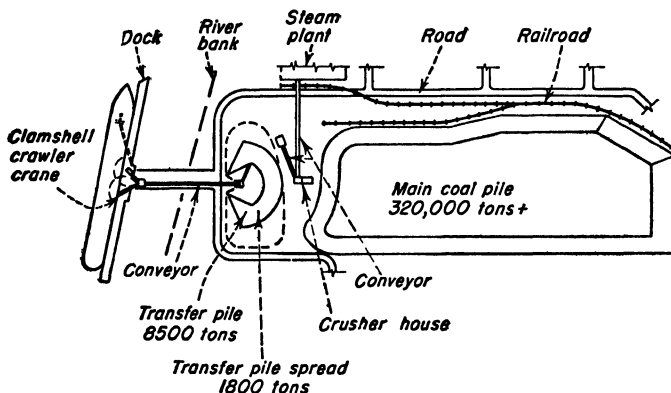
Coal-handling installation and storage pile at the Polymer plant. (ASME No. 47-SA-12).
